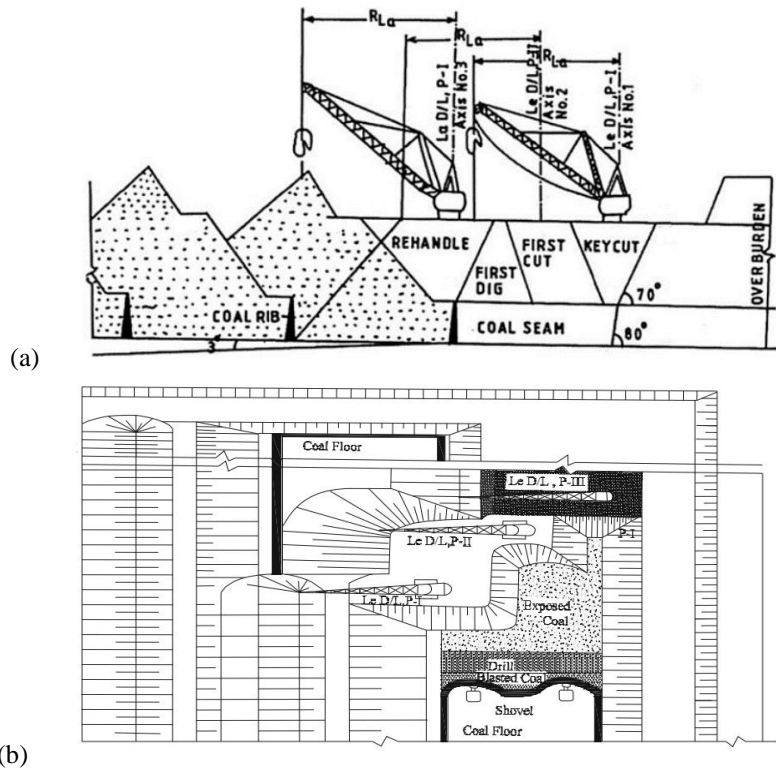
1 Draglines working in horizontal tandem method. (a) Section view. (b) Plan view
